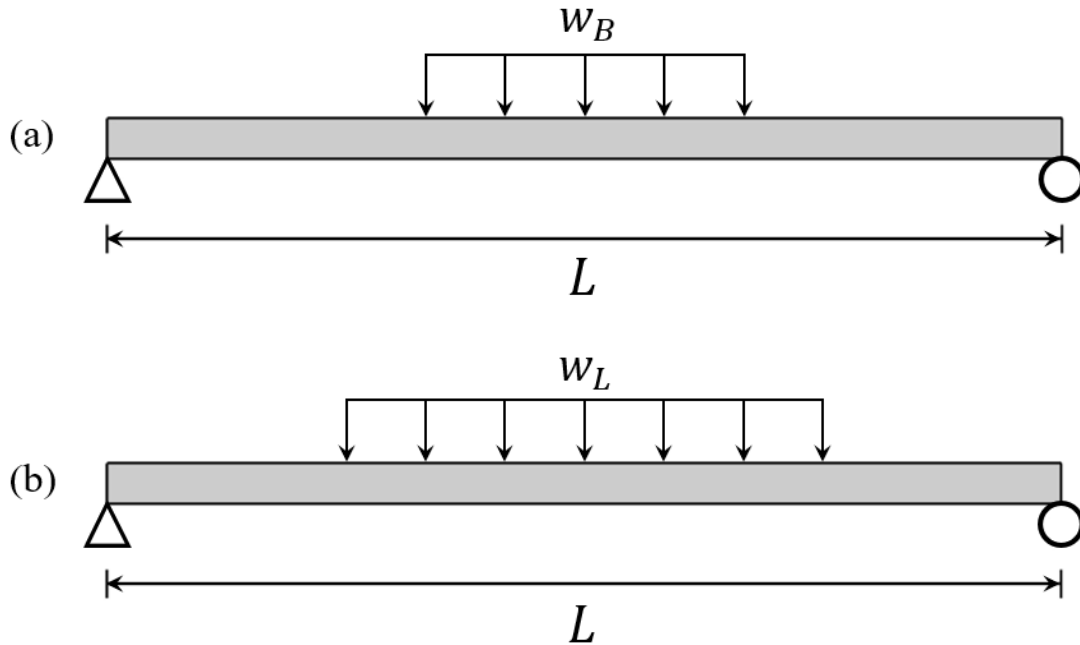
Loading configurations of supporting beams in (a) beam tests and in (b) floor tests
